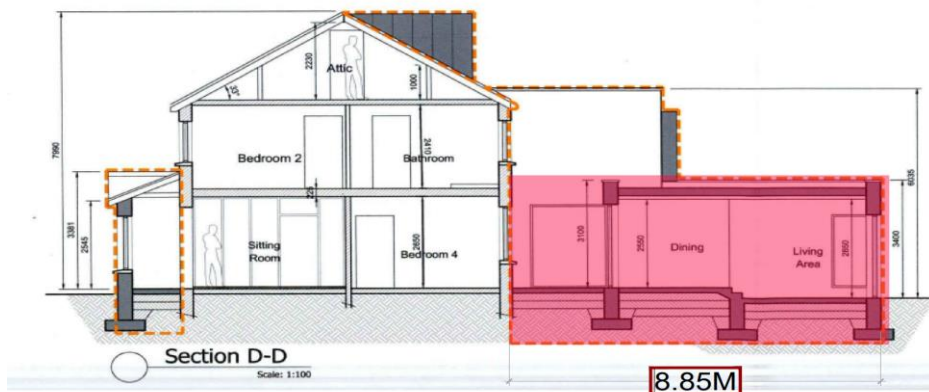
Extract taken from drawings submitted for planning, planning ref no: SD22B/0431 at 99, Muckcross Avenue, Dublin 12, 8.85m deep extension on the ground floor highlighted in RED.
